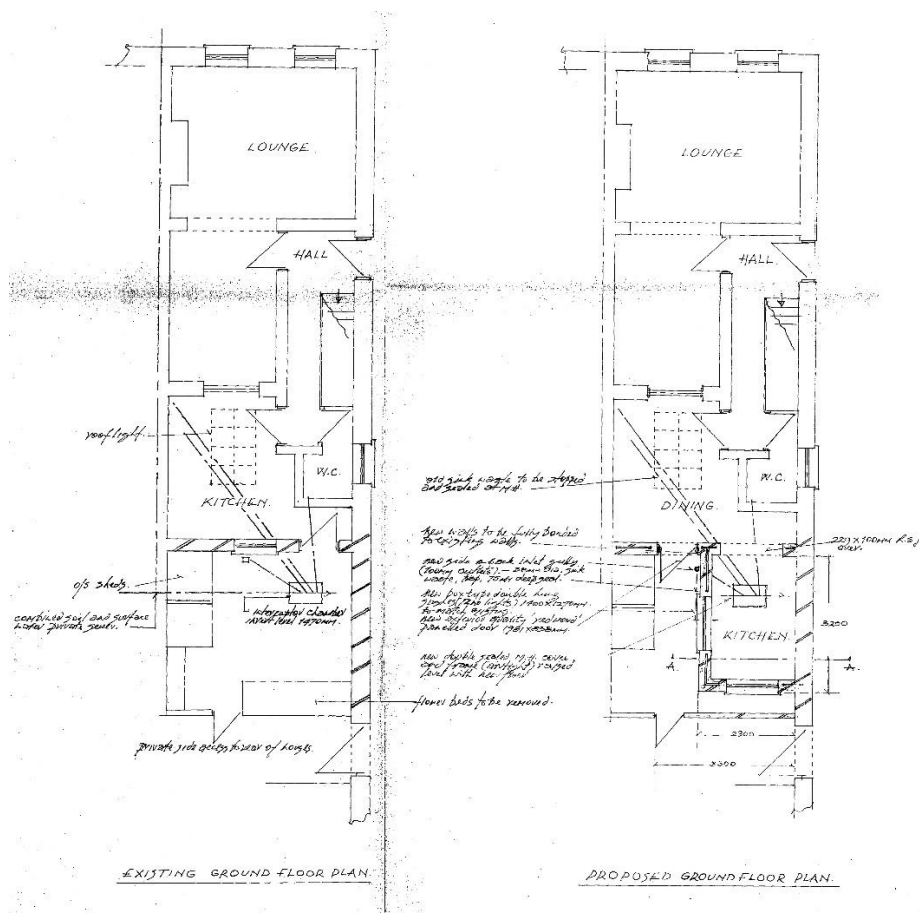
Extract from 1982 planning approval, showing existing full-width single storey element
